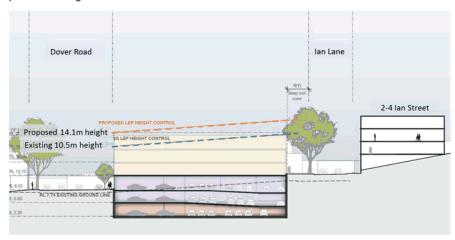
Section of maximum building heights between Dover Road and Ian Lane
